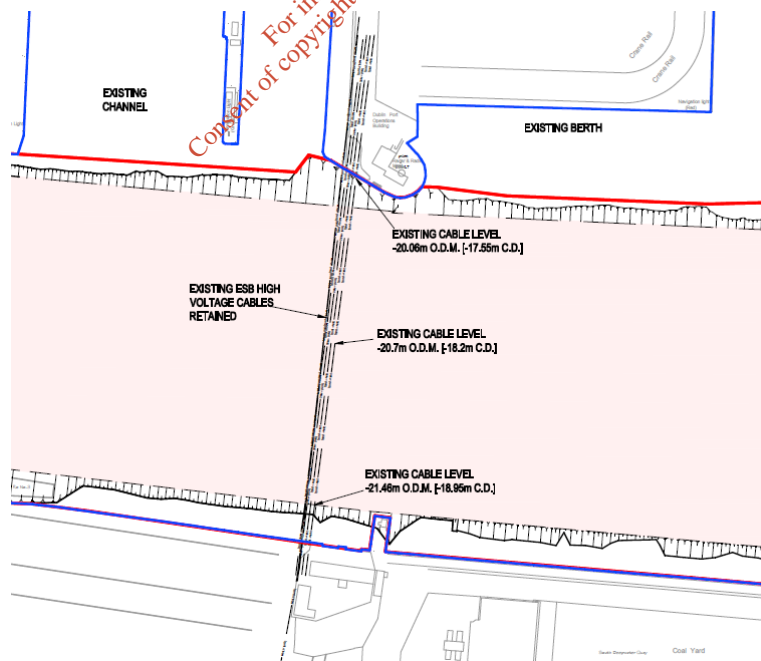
Extract 'Proposed Channel Layout Sheet 2' showing easternmost cable crossing
